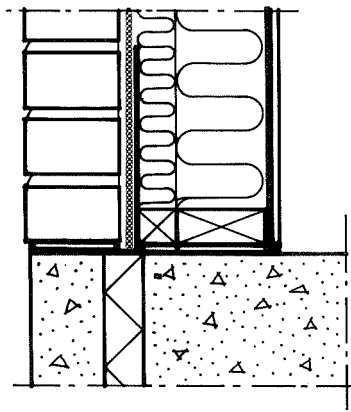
Example of a joint between wooden wall and concrete slab. The facade panel is extended so that it covers the joint. The concrete slab is insulated on the underside.
